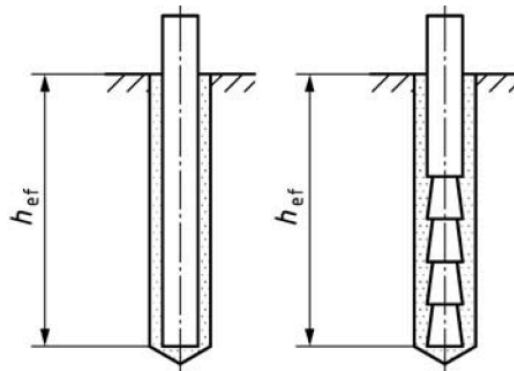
Bolts of type D: bonded anchors (left), bonded expansion anchors (right).
